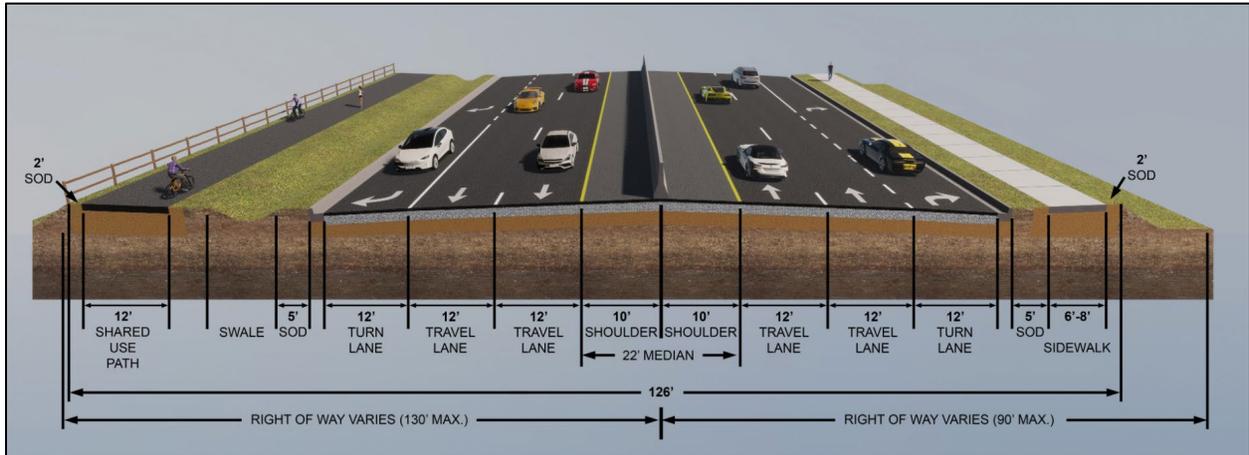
Preferred DeSoto Bridge Typical Section
